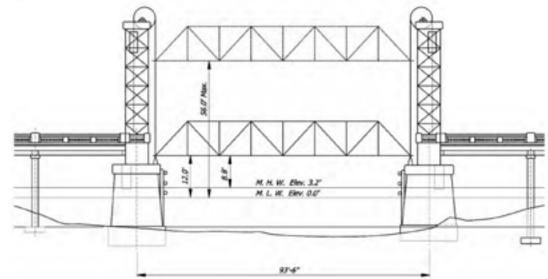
Bridge elevation view for a vertical lift bridge indicating vertical clearances. (Source: Florida DOT)
